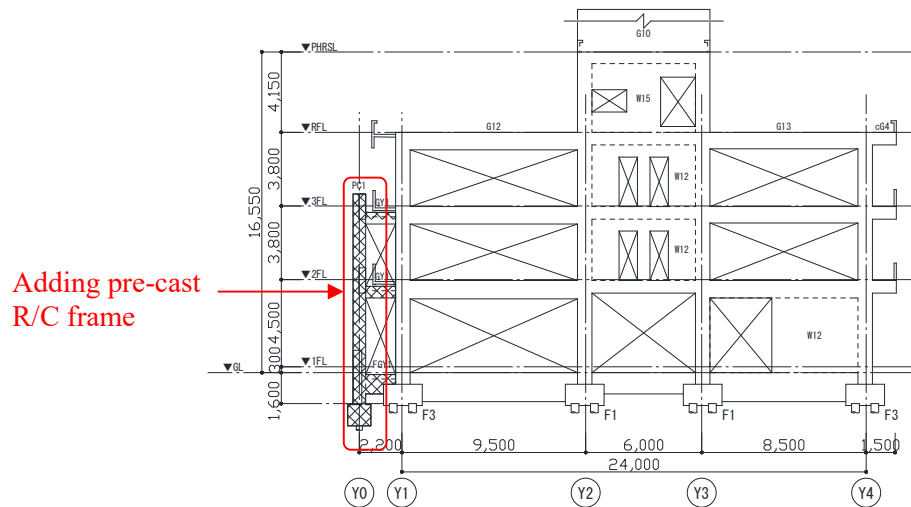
y-direction (south to north) X4 frame structural elevation
